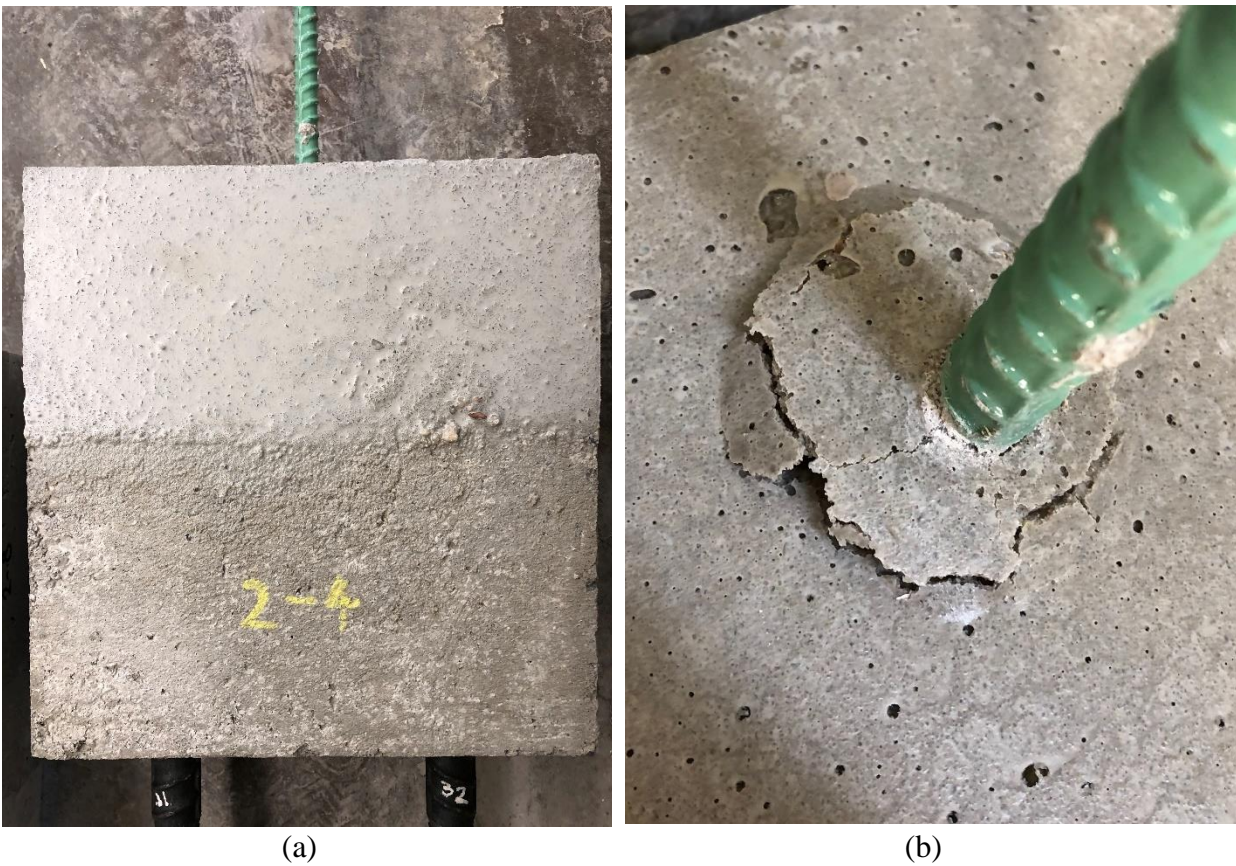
(a) Elevation view of pullout failure, 2-04, (b) Pullout at top of HCSC, 2-04
